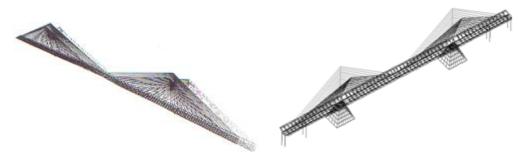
Static Deformation Due to Dead Load for; (a) Suez-Canal Bridge, (b) Aswan Bridge
